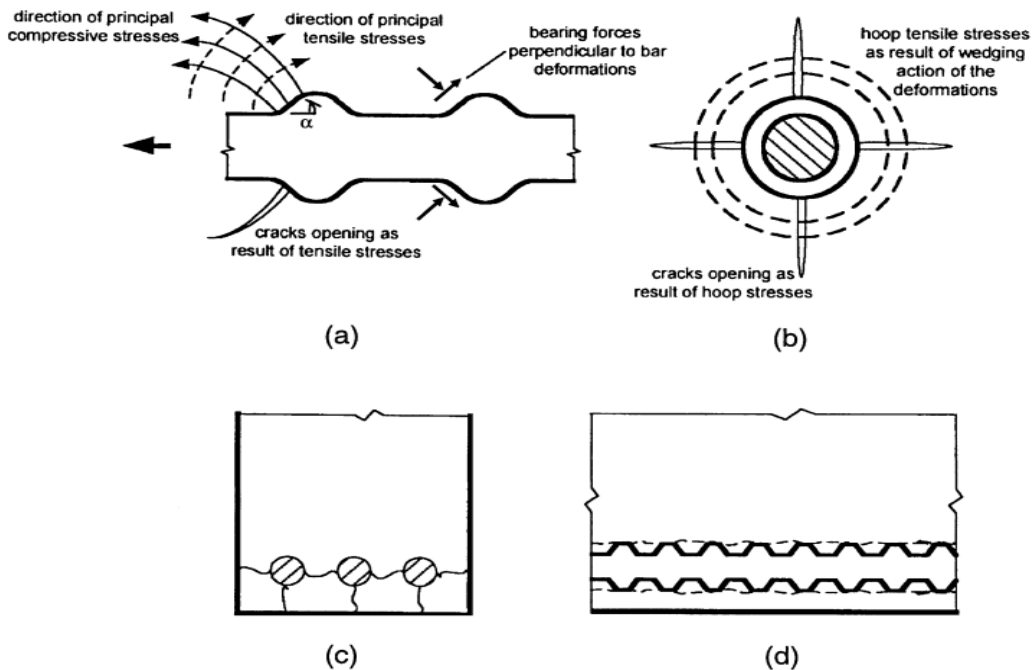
9 Cracking and damage mechanism in bonds (ACI 408R-03)
